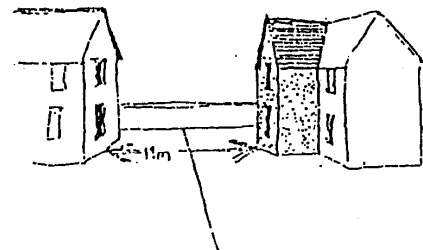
Ground floor rear extensions within 1m of the common boundary to an adjoining dwelling should not normally exceed 2.5m in length
